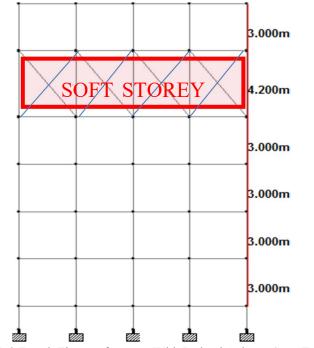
9 Fourth Floor Soft Storey With Inclued Column (CASE VII)
